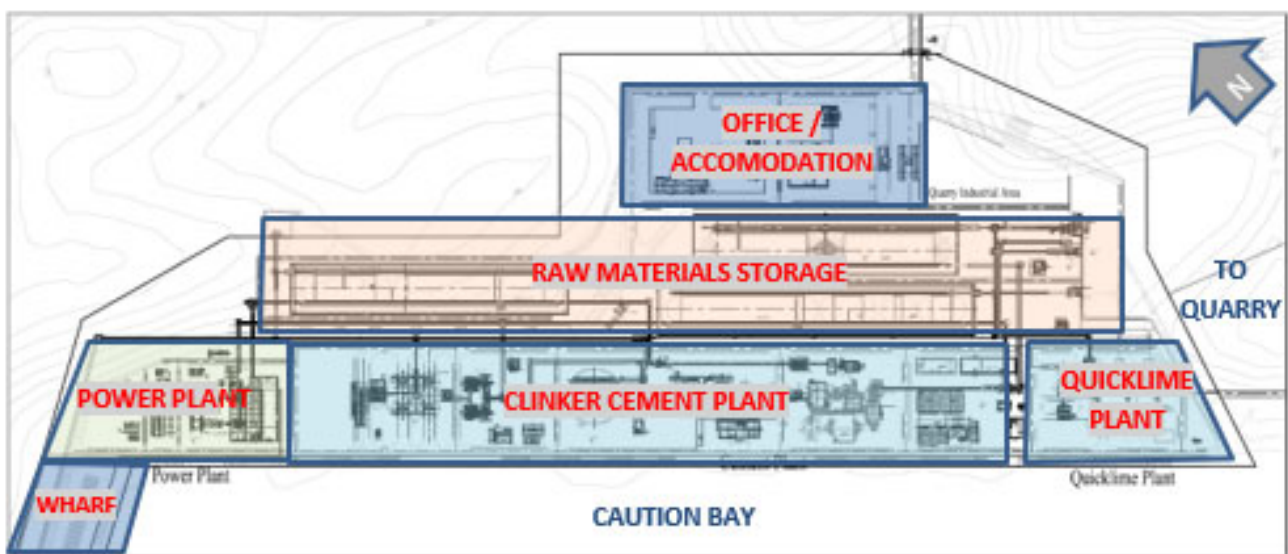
Kido plant and infrastructure site general layout (indicative only)
